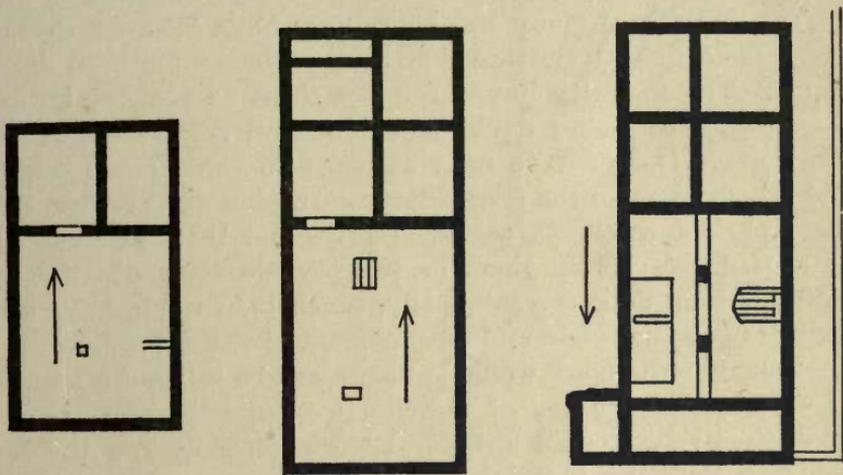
Plans of Workshops, Silchester. (After Hope.) (40 ft. to 1 in.)
